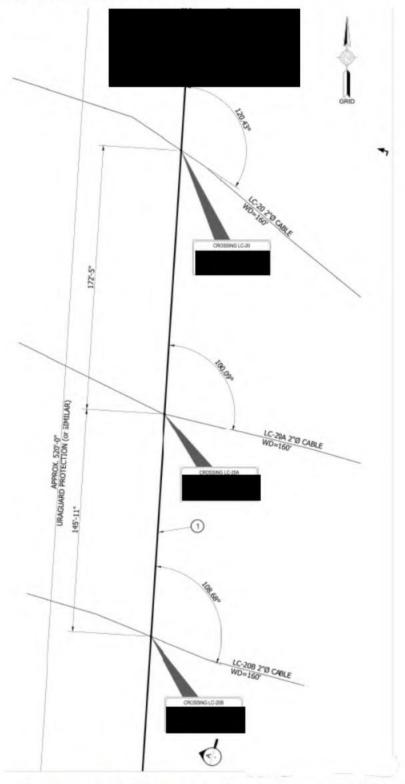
LC-20, LC-20A & LC-20B Crossing Arrangement Plan
